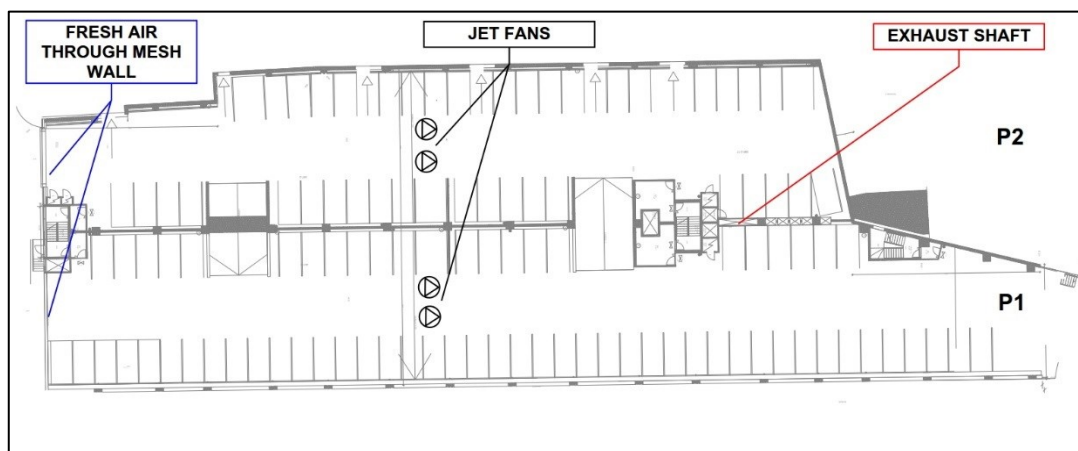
Floor plan and ventilation configuration for decks P2, P1
